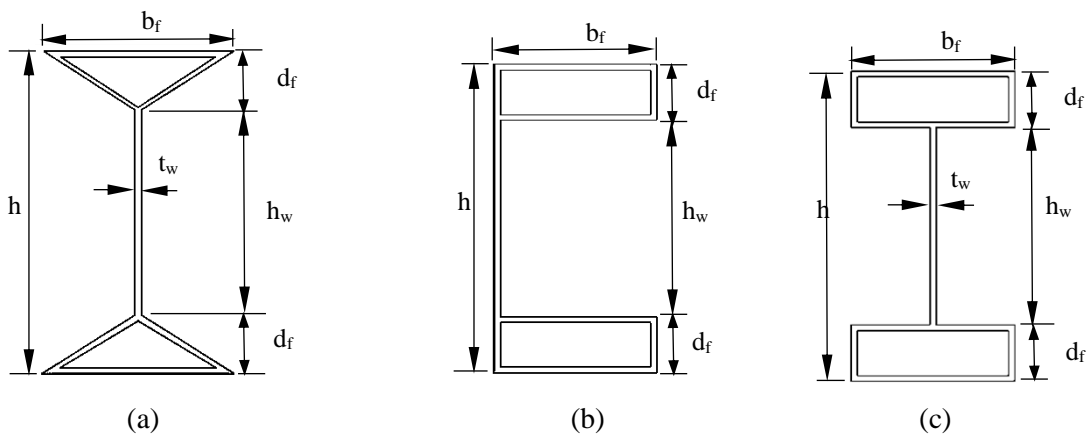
Hollow flange girders including (a) triangular hollow flange beam, (b) LiteSteel beam and (c) rectangular hollow tubular flange plate girder
